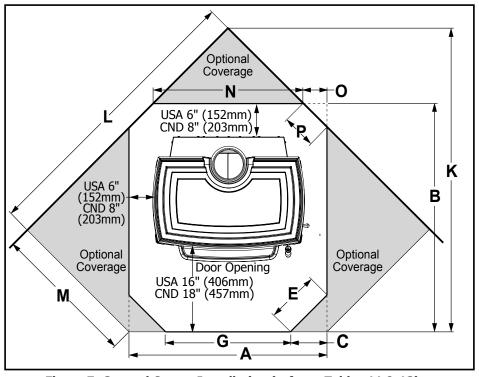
General Corner Installation (refer to Tables 11 & 13).
